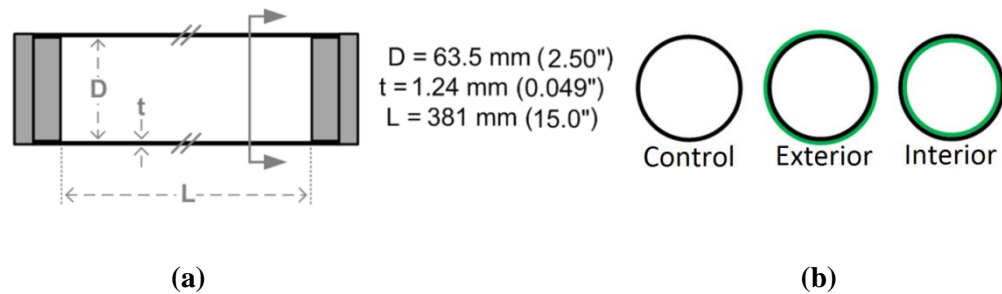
Specimen details; (a) tubular structure dimensions and (b) polyurea coating locations
